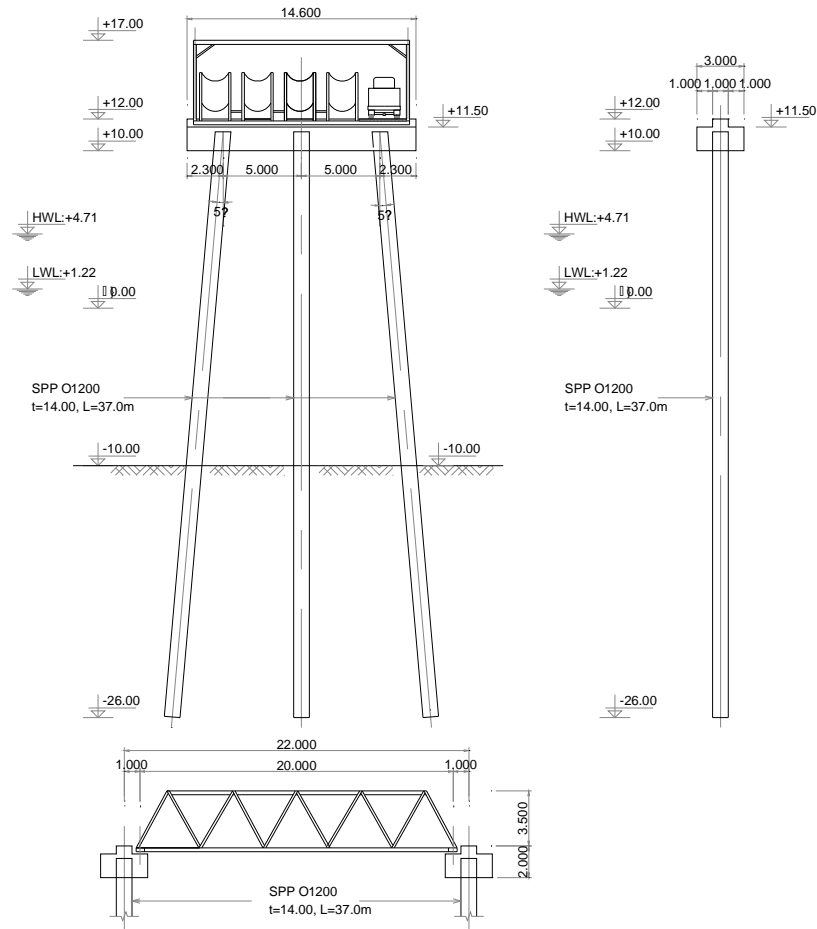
Typical Drawings of Trestle for Belt Conveyor
